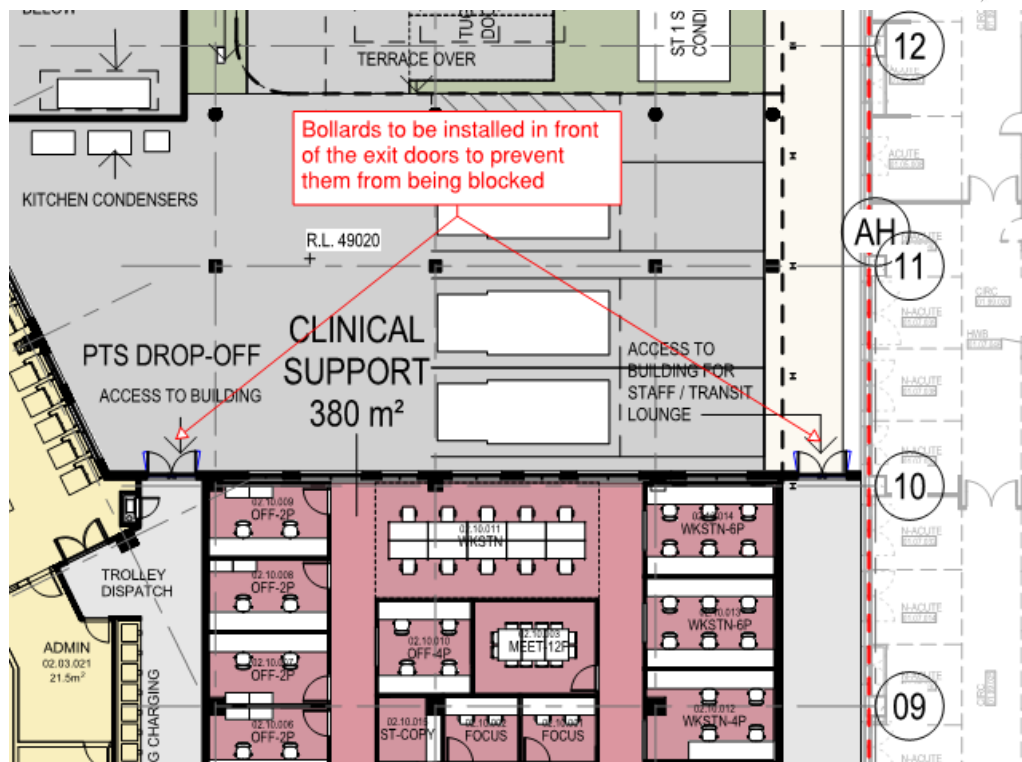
Bollards to be installed in front of exit doors discharging on Level 00
